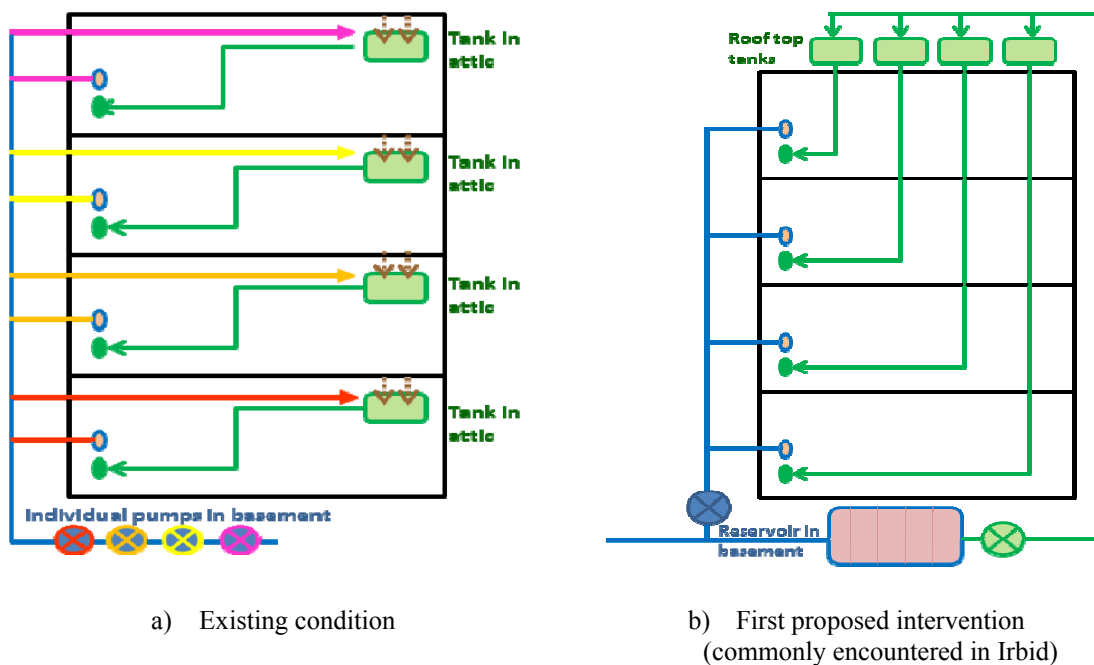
Existing water supply conditions in Tebbaneh and the first proposed intervention
